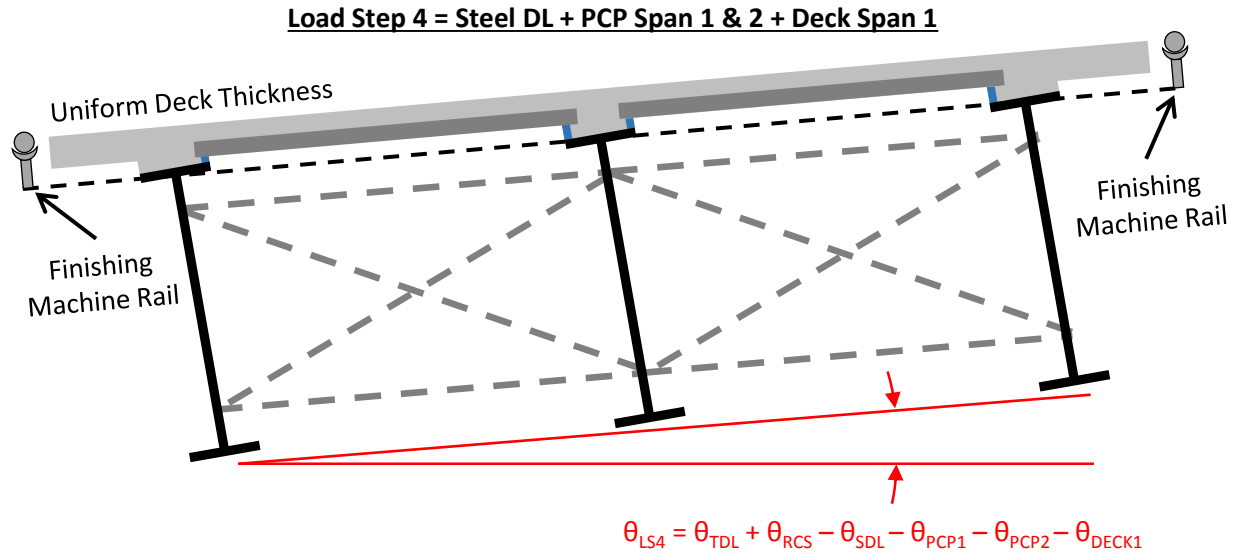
Load Step 4– Steel I-Girder System Twist SDF – Section A-A
